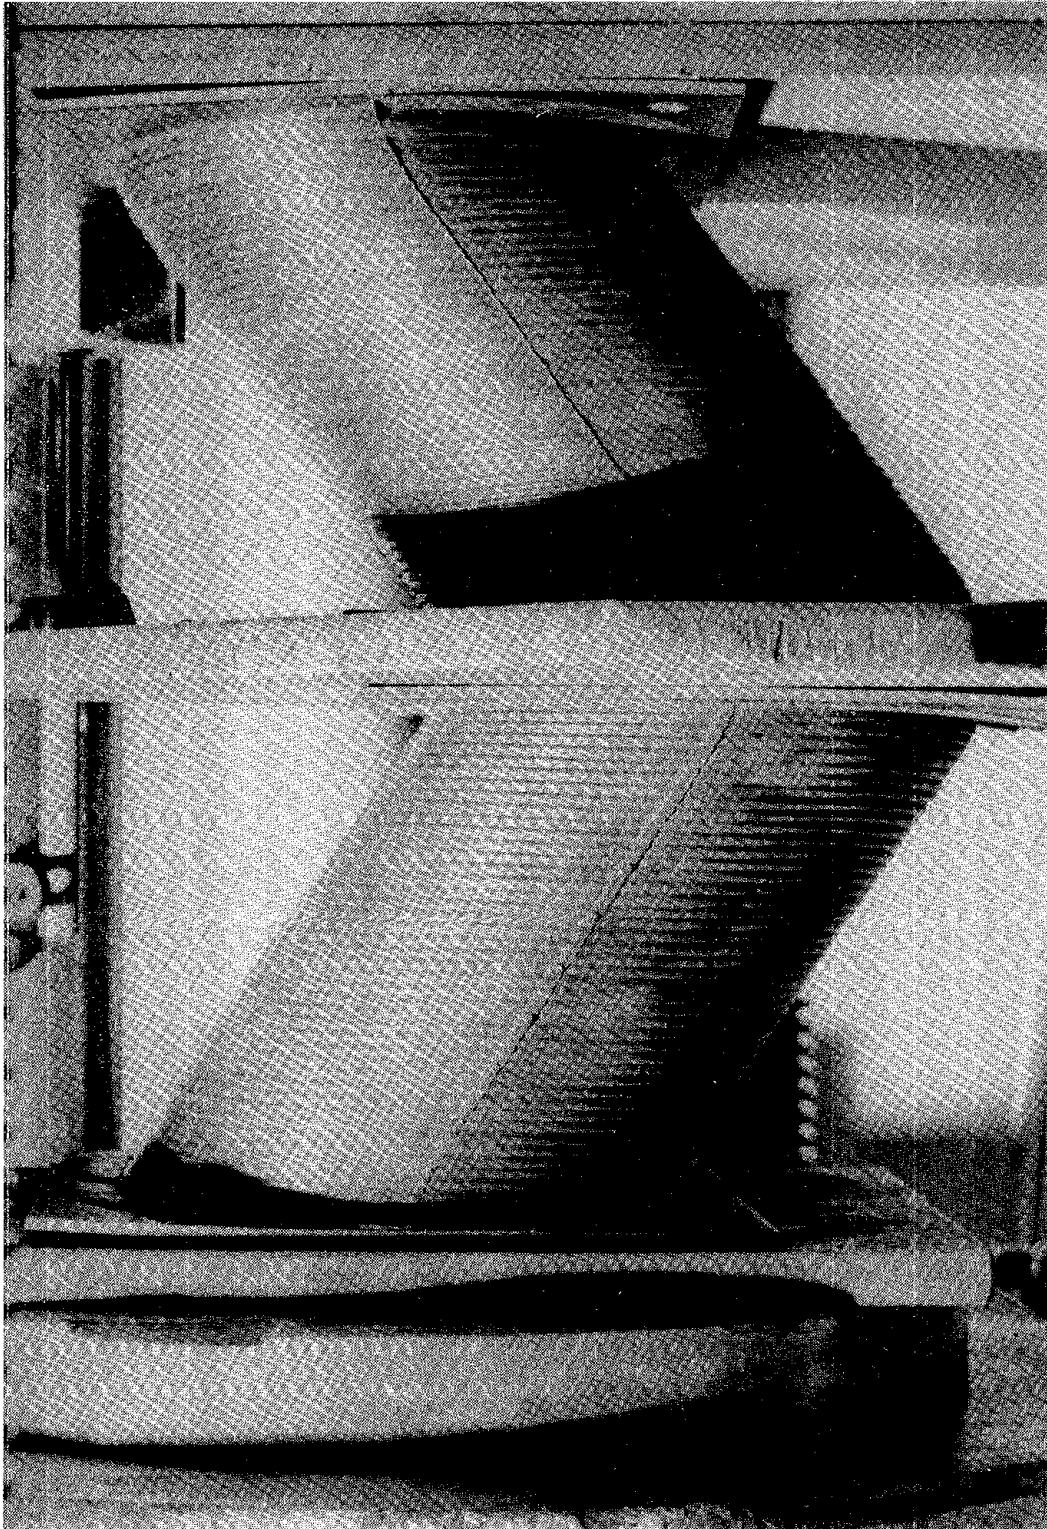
Static test of bearings under simultaneous vertical and horizontal load. Two bearings were tested simultaneously.
